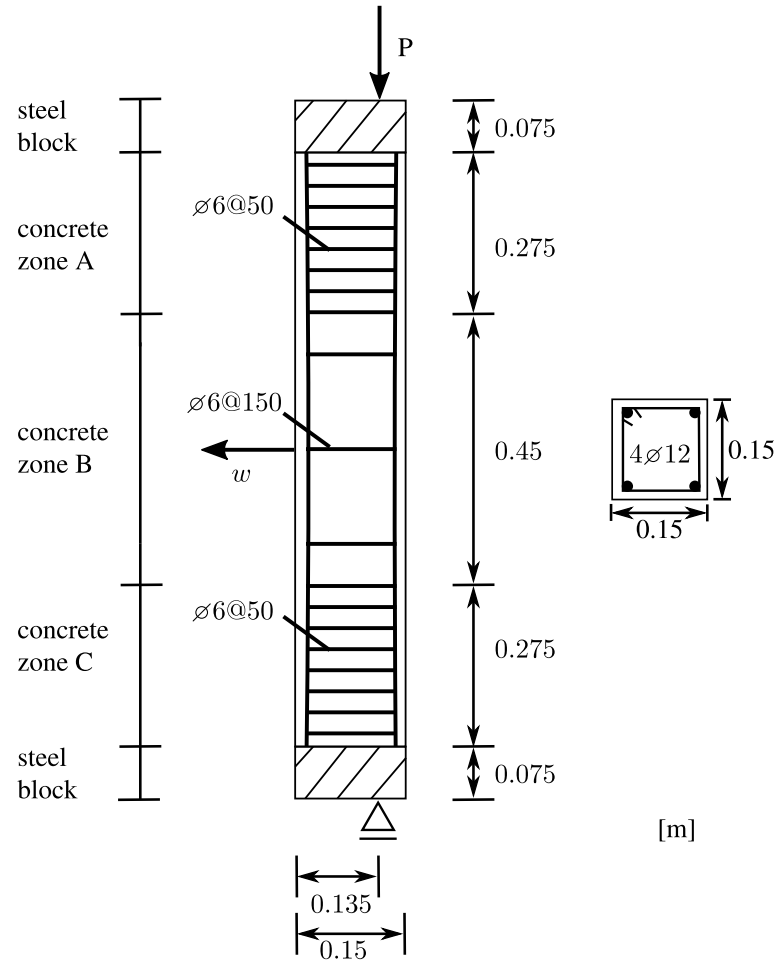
Geometry and setup of the reinforced concrete column (Němeček et al., 2005).
